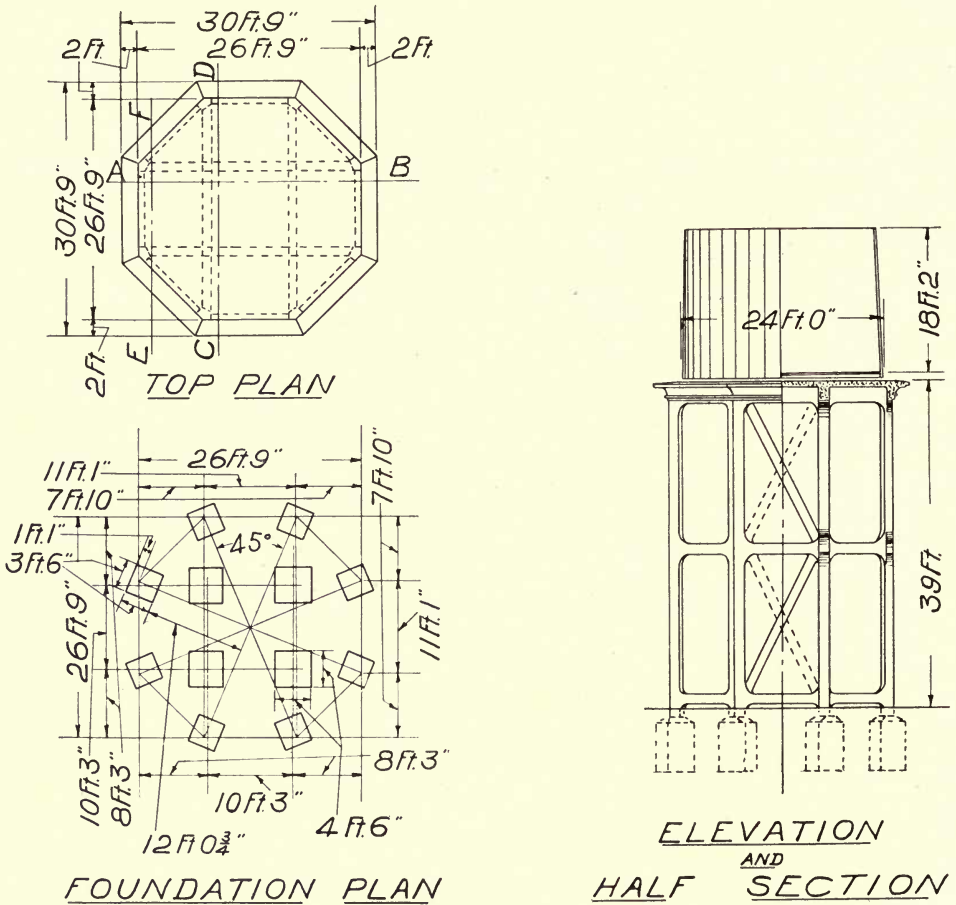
PLAN, HALF SECTION AND HALF ELEVATION, WATER TANK SUPPORT, N. Y., N. H. & H. R. R.
